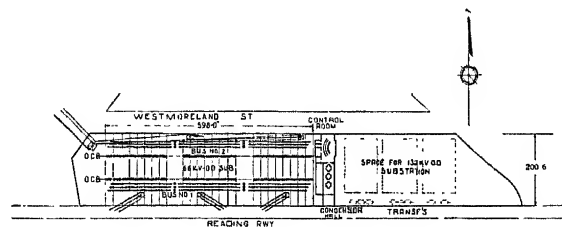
WESTINGHOUSE SUBSTATION PLAN
